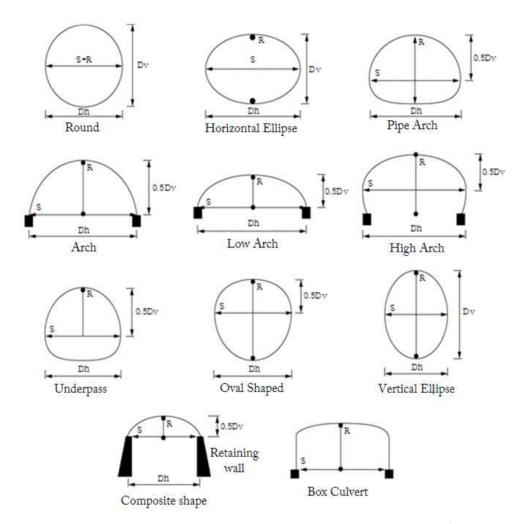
Applied cross-section of corrugated steel plate structure (S=width-span, R=height-rise)
